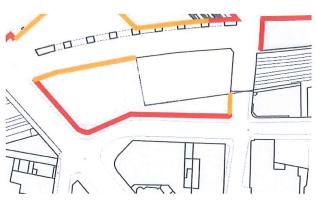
Ground Floor principle hierarchy of elevations
